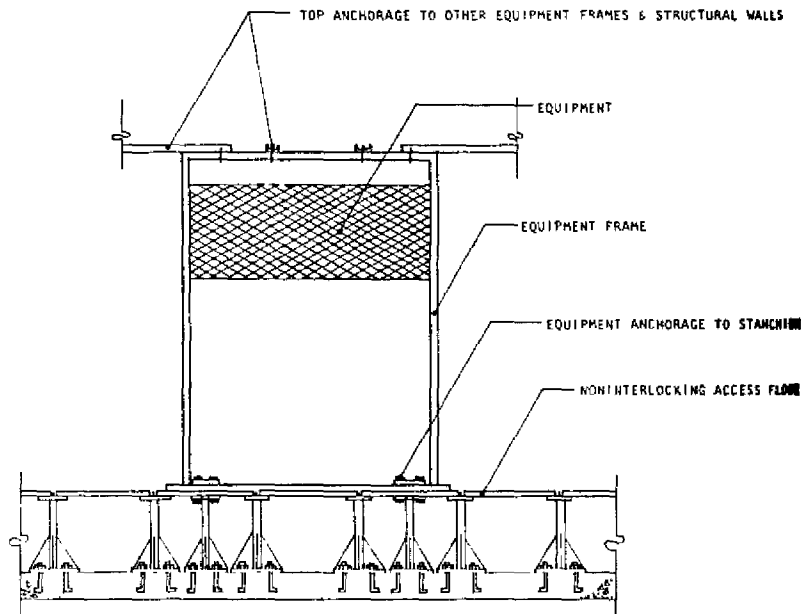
Communication systems. Equipment frame anchorage to noninterlocking type access floor.
